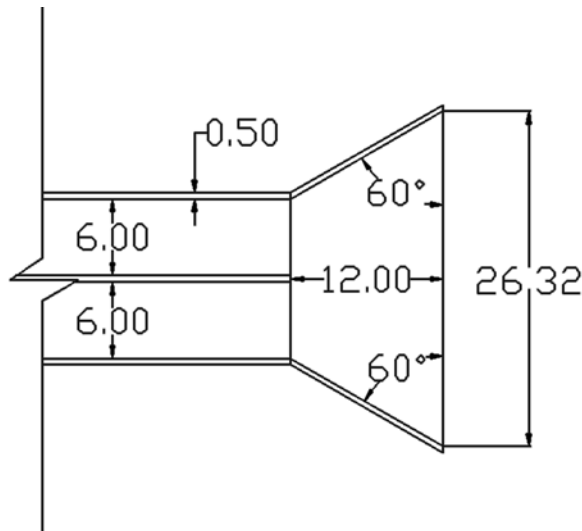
Plan View of Culvert Outlet (Downstream)
